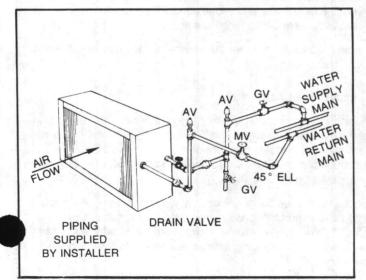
Typical Piping for Type W, Two-Row Water Coil
